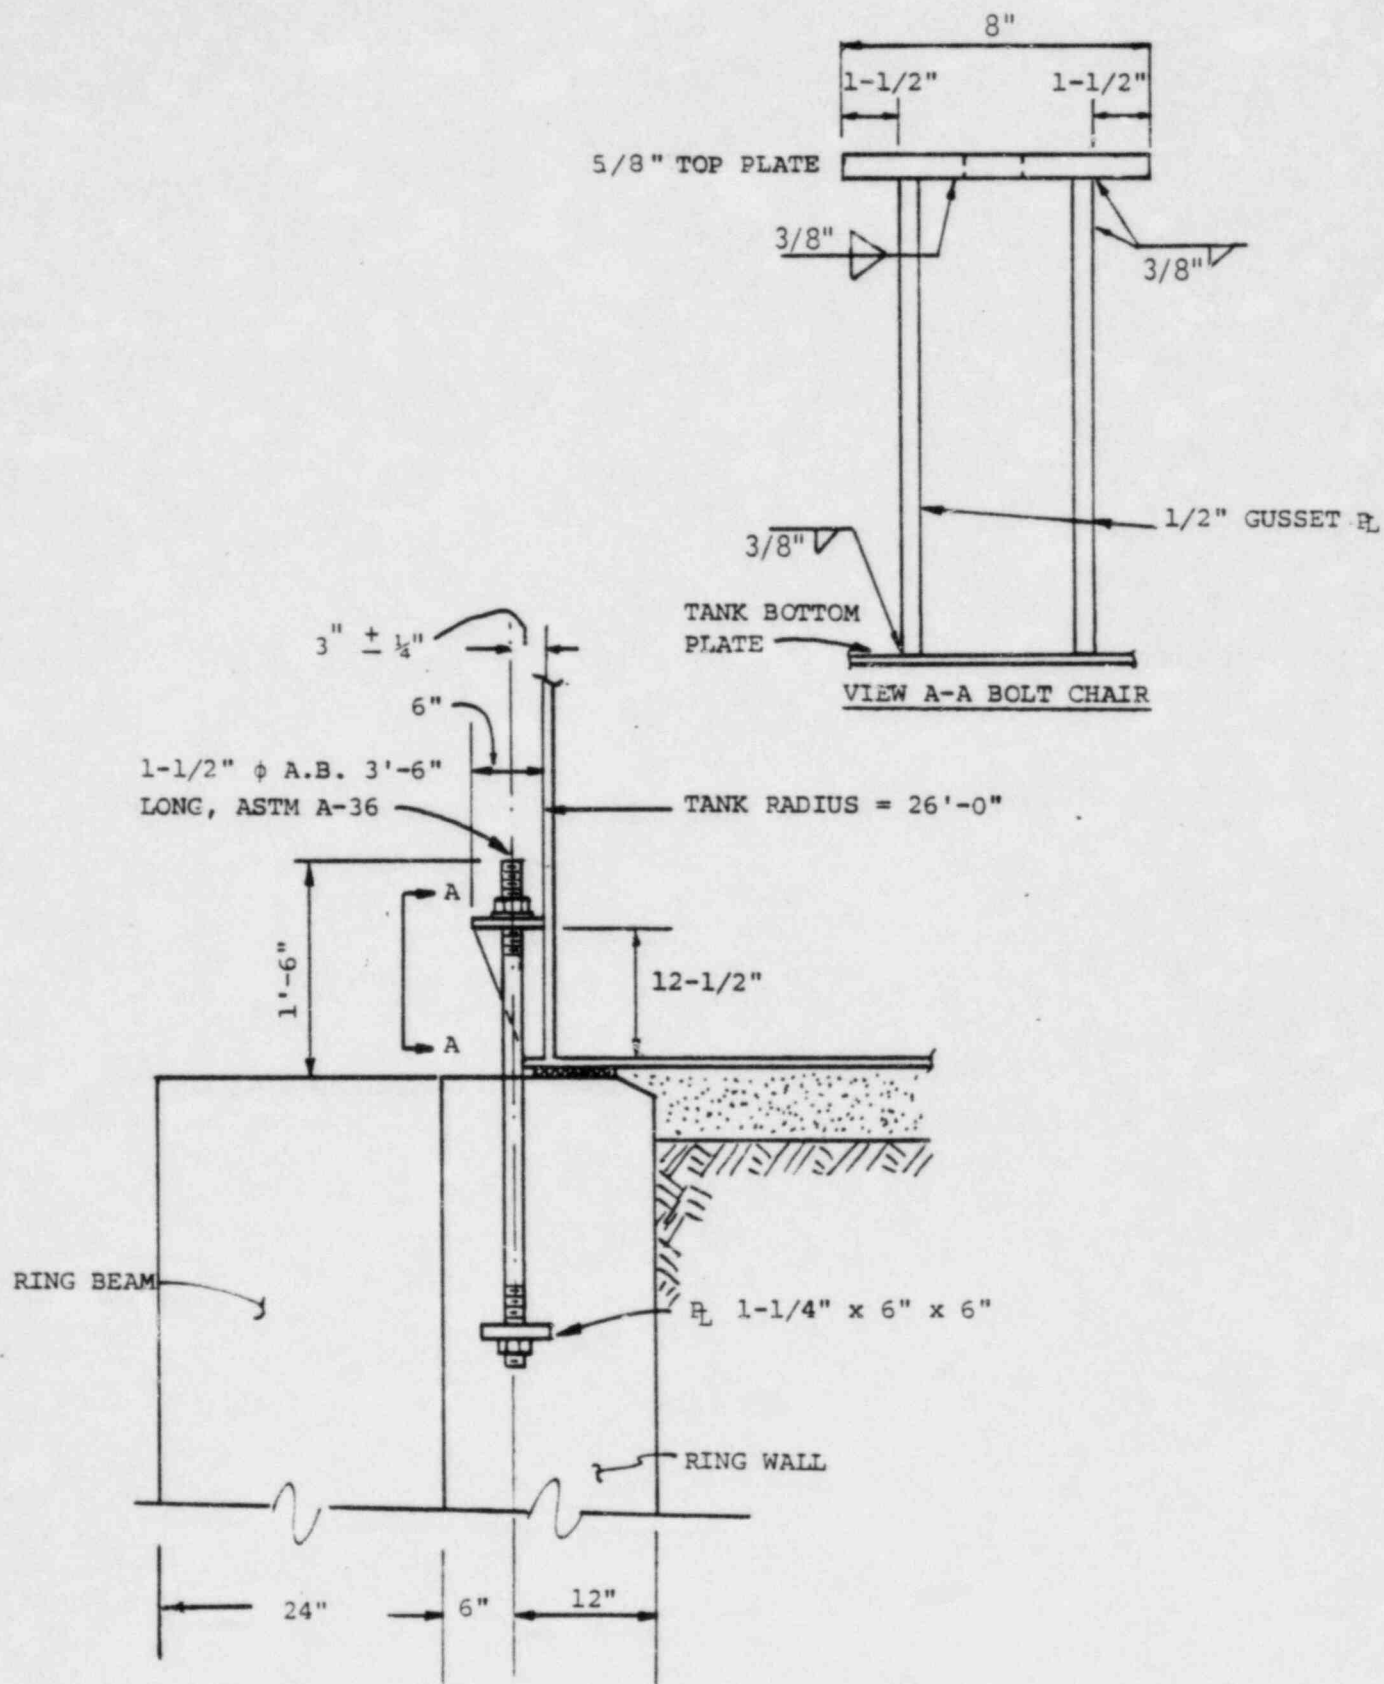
BWST ANCHOR BOLT AND BOLT CHAIR DETAIL
